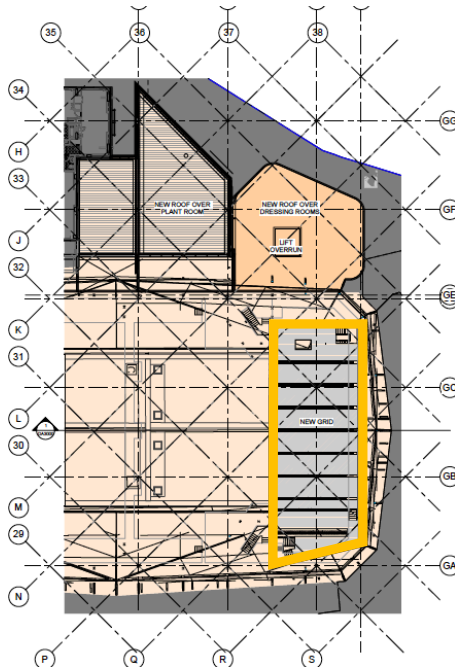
New Construction – Building Envelope – Insulation Mark Up – FLYTOWER (Grid Level)
